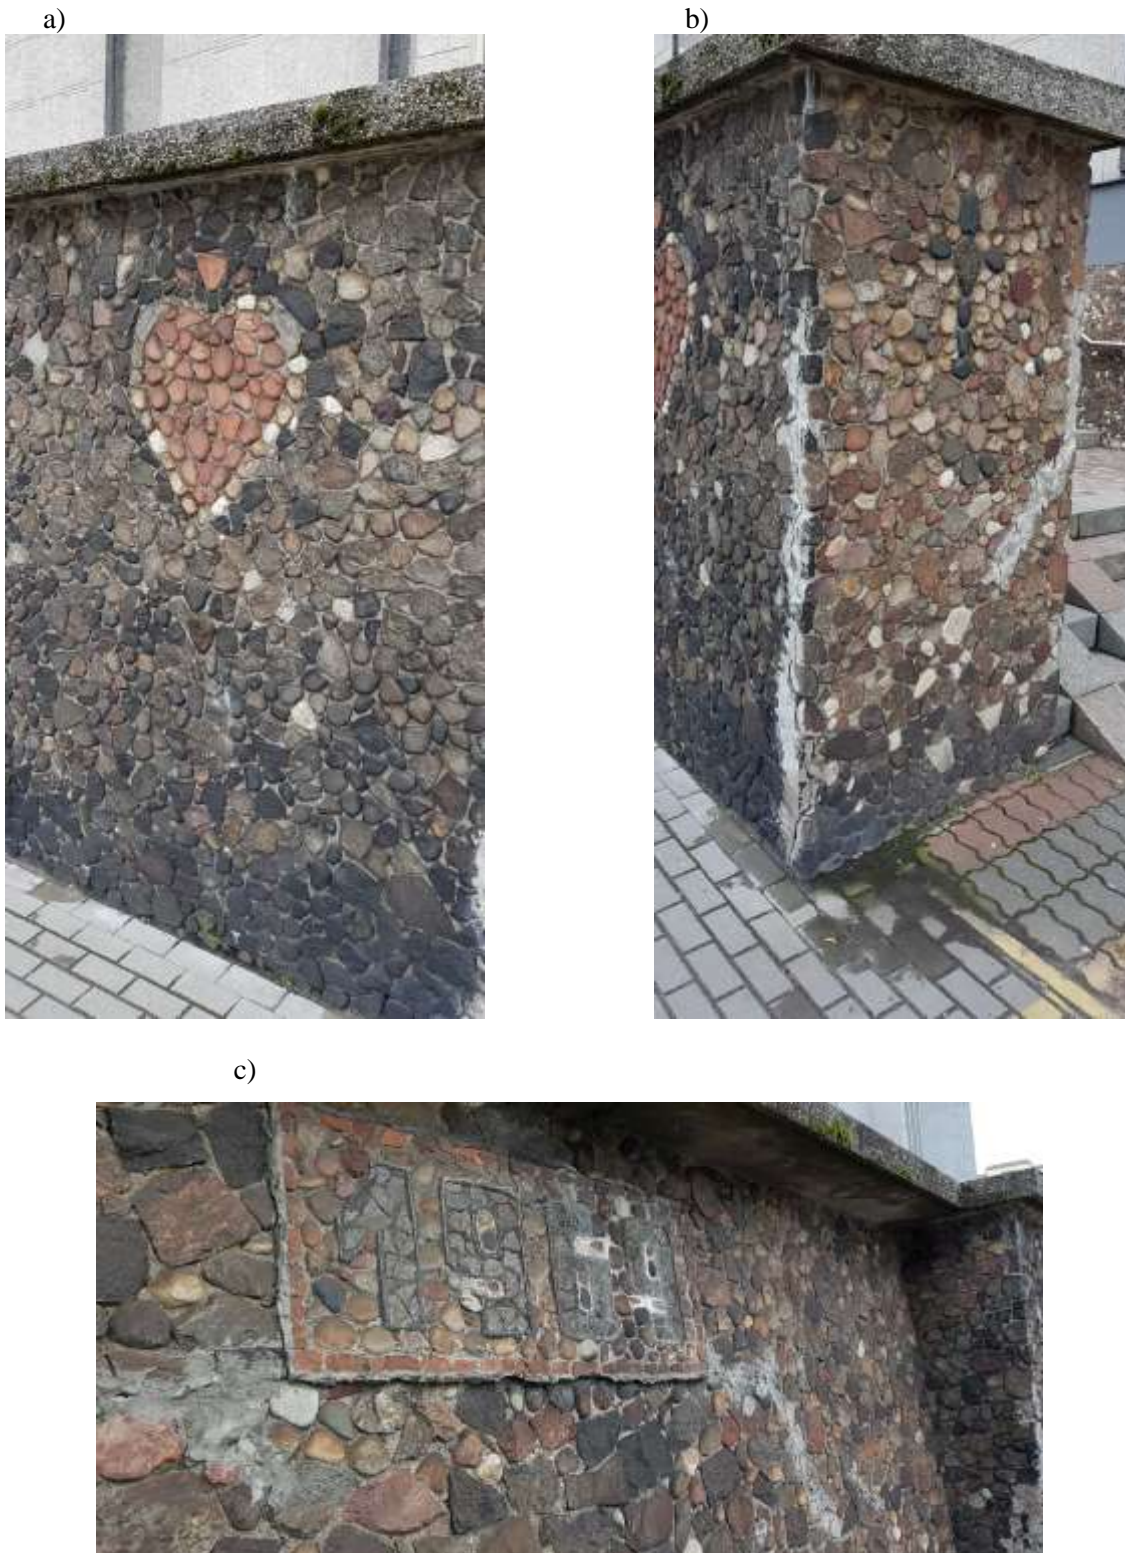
Characteristic symbols made in the stone cladding of the wall from the west elevation (along 3 Maja Street): a) heart, b) cross, c) 1969 (year of completion of the construction of the church) (street names as of 2023) (photo by Maciej Niedostatkiewicz)
